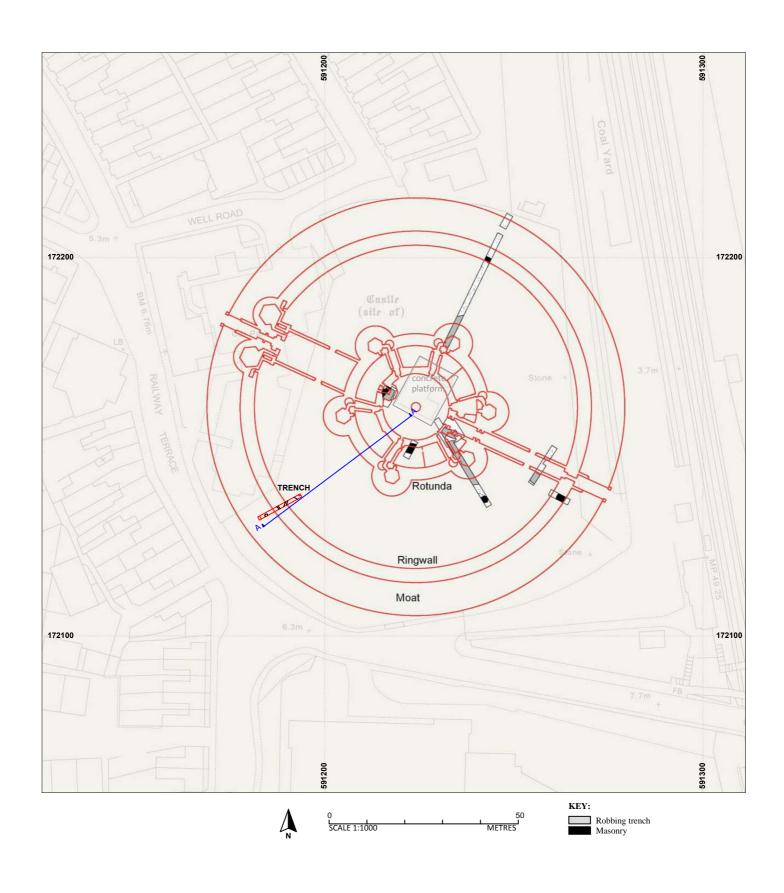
Trench location plan in relation to OS map, Hatfield's plan of Queenborough castle and Wessex's evaluation trenches
